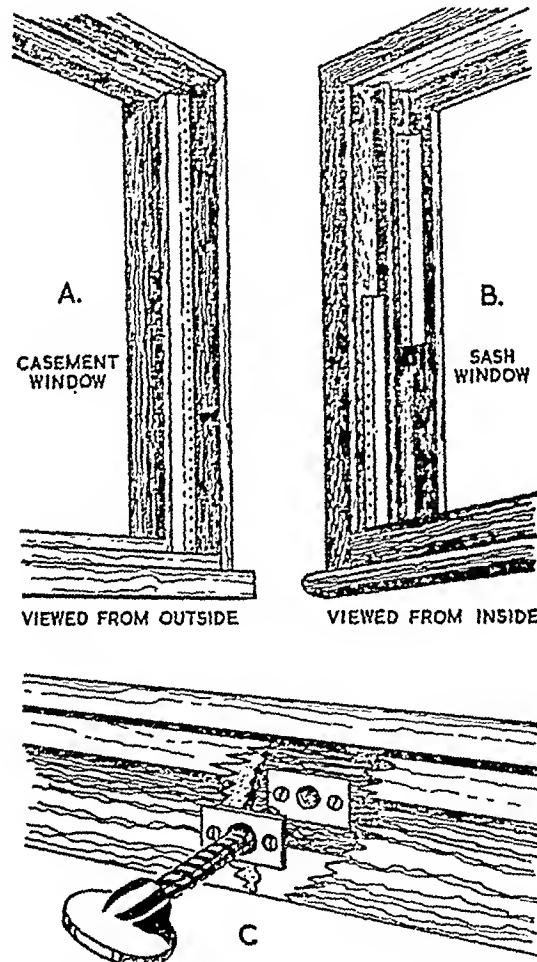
(a, b) Draught-proofing (c) Sash screw
